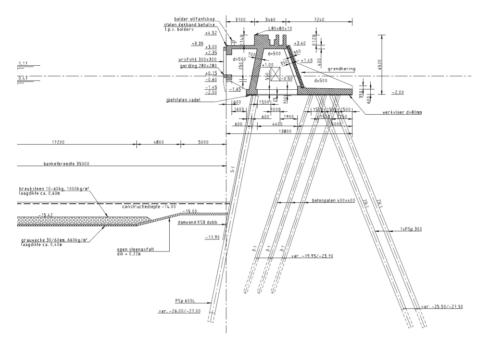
Cross section Sint Laurenshaven with asphalt matrasses after deepening
